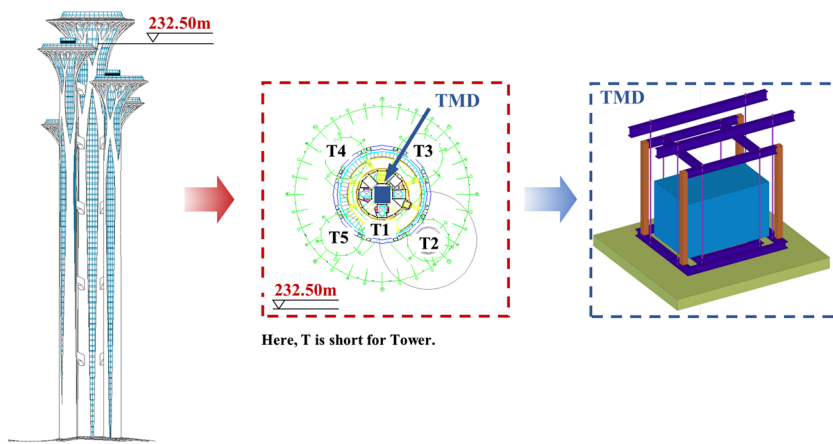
Position of the double-stage pendulum tuned mass damper in elevation and plane
